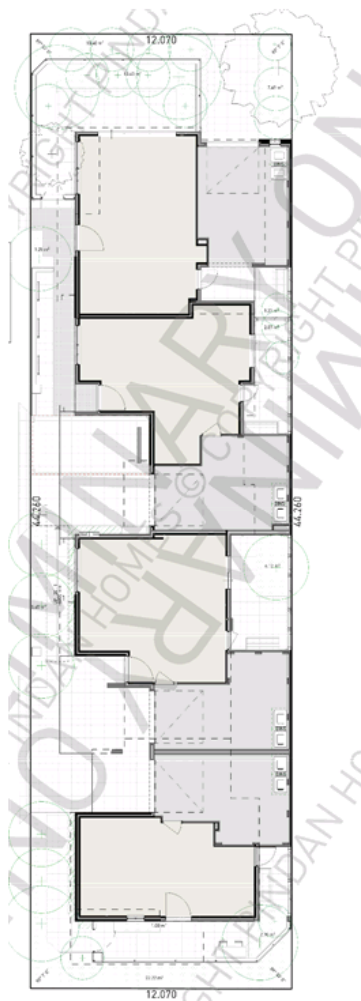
157 Loftus Street, Leederville Proposed Site
